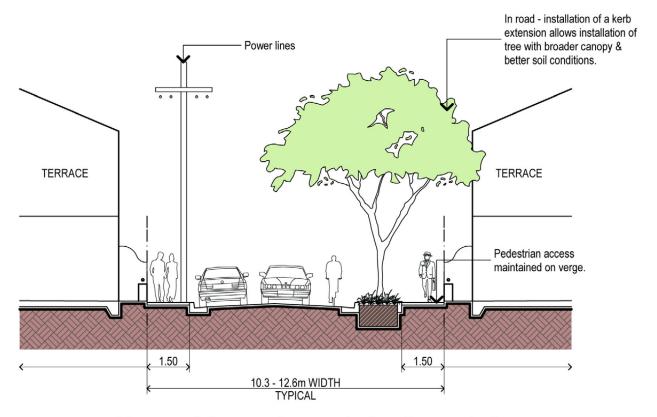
Existing narrow street with now existing planting, narrow footpaths and minimal building setbacks (eg. Elswick Street, Petersham.
